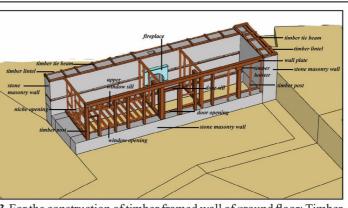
Construction process of a traditional house (448-2) in Sivrihisar
